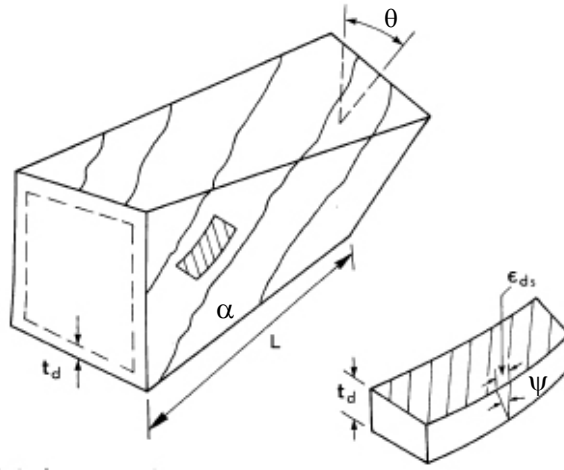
Warping of member wall section (Collins and Mitchell, 1974)
